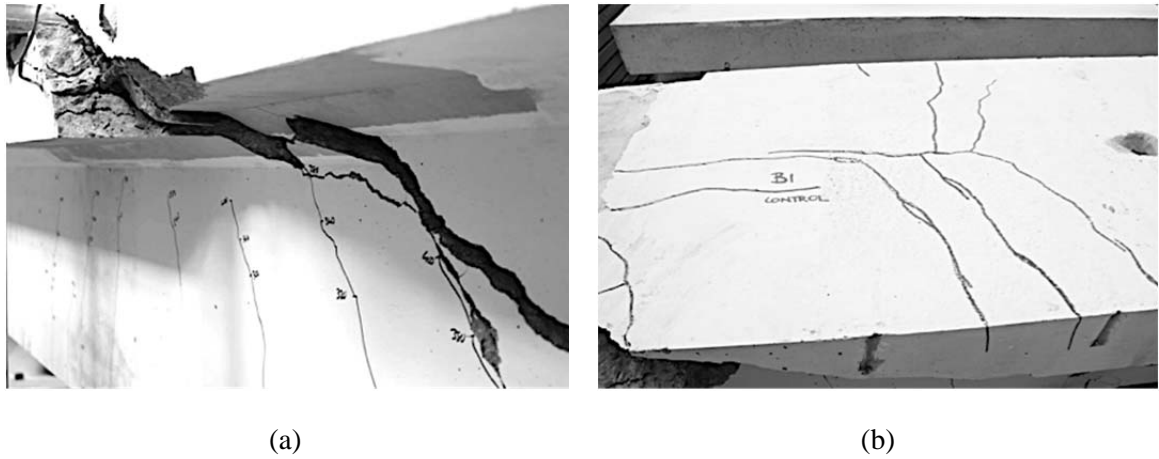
Specimen LBC after testing: (a) crack penetration into the slab, (b) slab failure mode.
